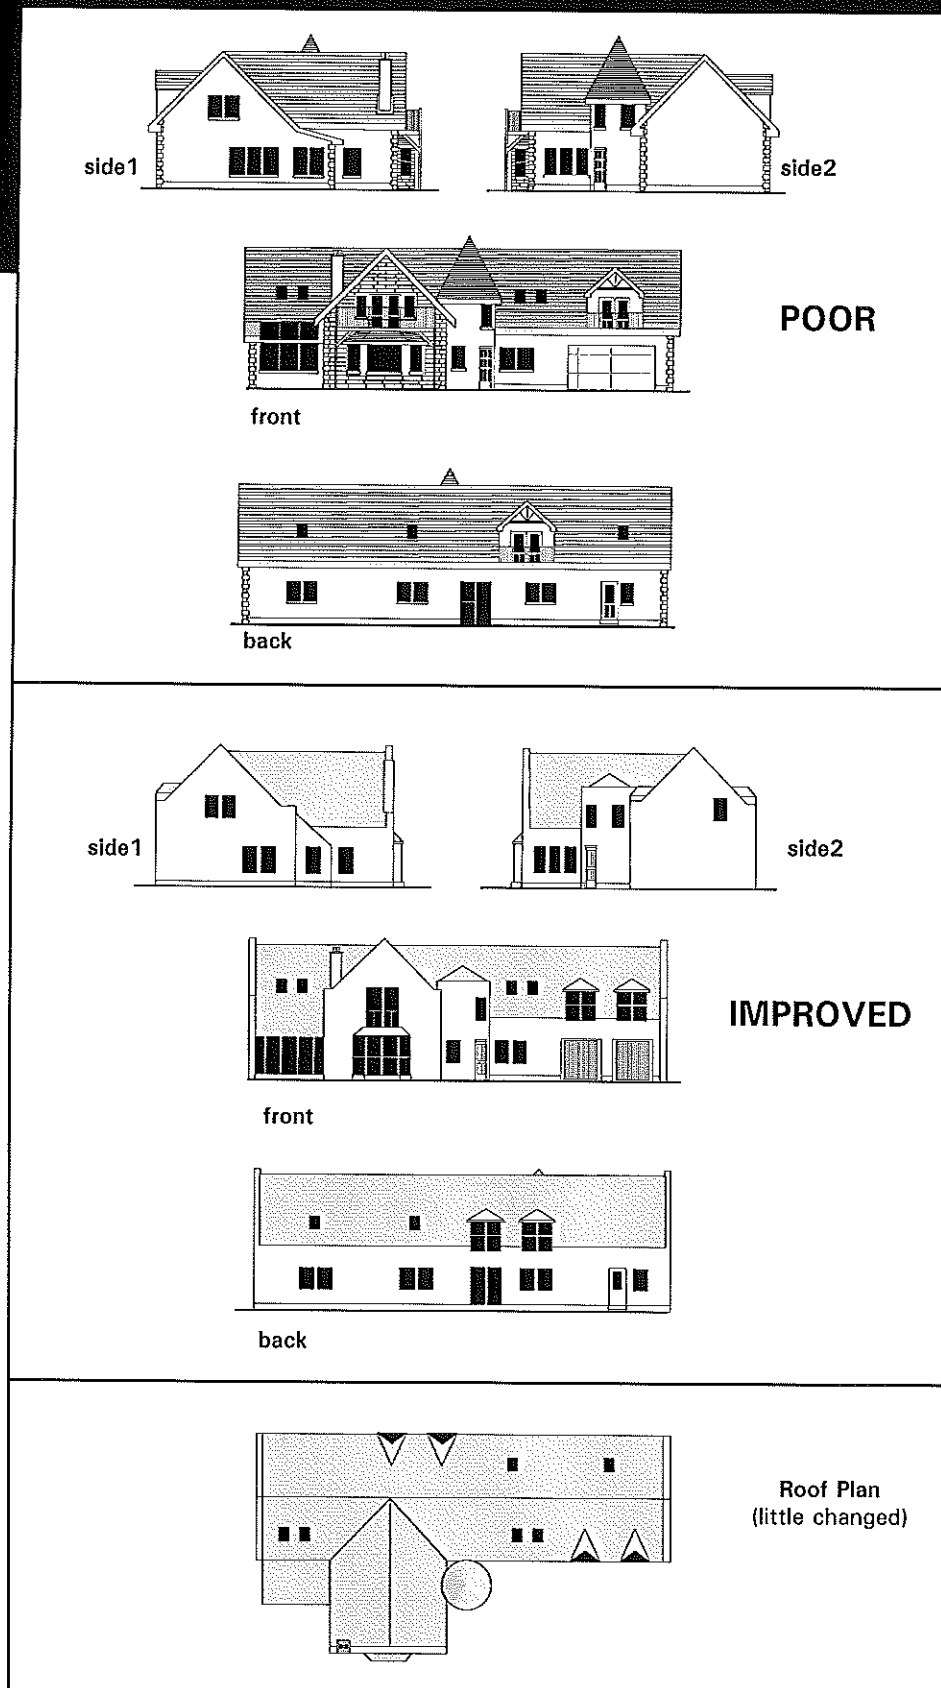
HOUSE DESIGN MODIFICATION B : OVER FEATURED ORIGINAL
